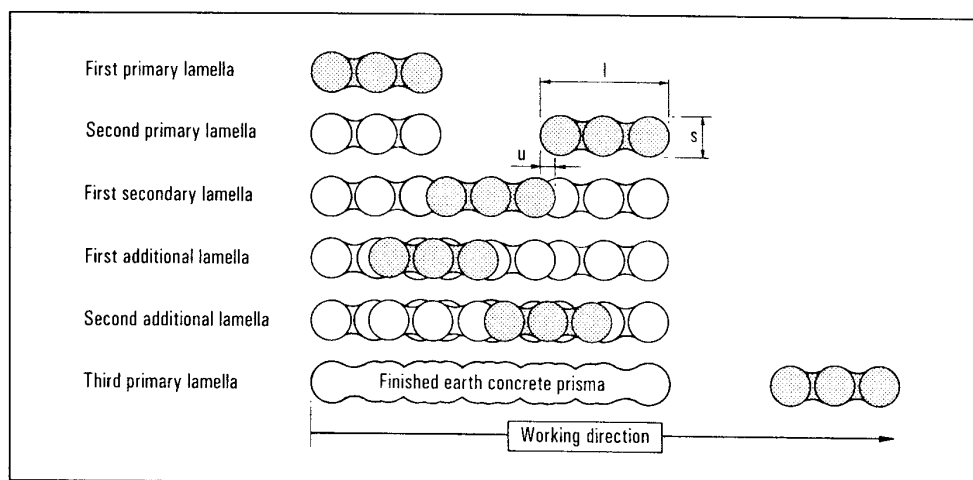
Sylvenstein dam: Steps in the construction of the soil-cement mixed wall (Wilder et al., 2002)
